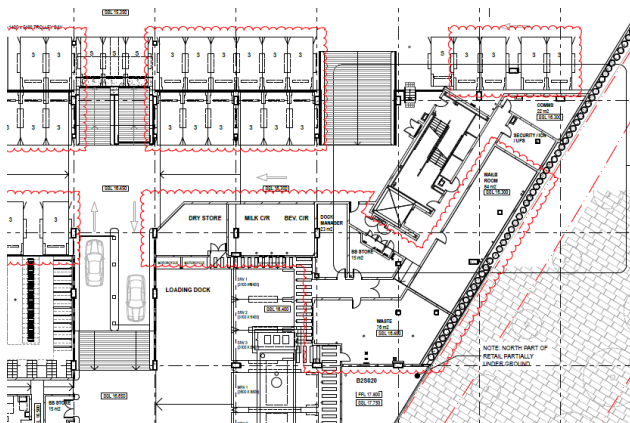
Approved General Arrangement Plan – Lower Ground (MOD 6)
